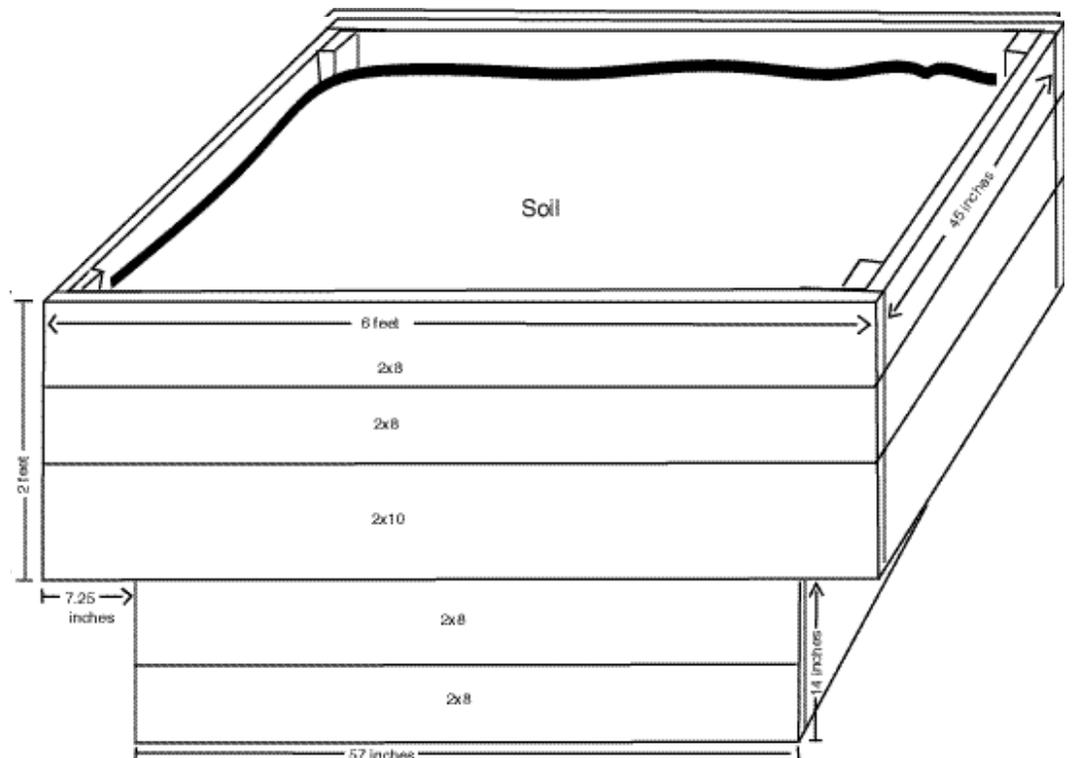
3D view of tall planter. To construct a shorter version for wheelchair accessibility, eliminate the upper 2x8 row on the top section.
